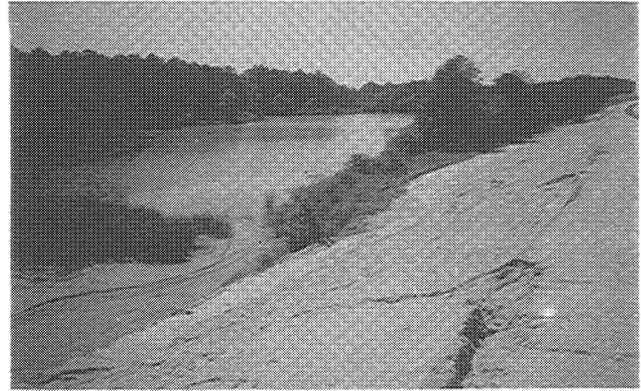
Advanced gully erosion on an abandoned construction site.
